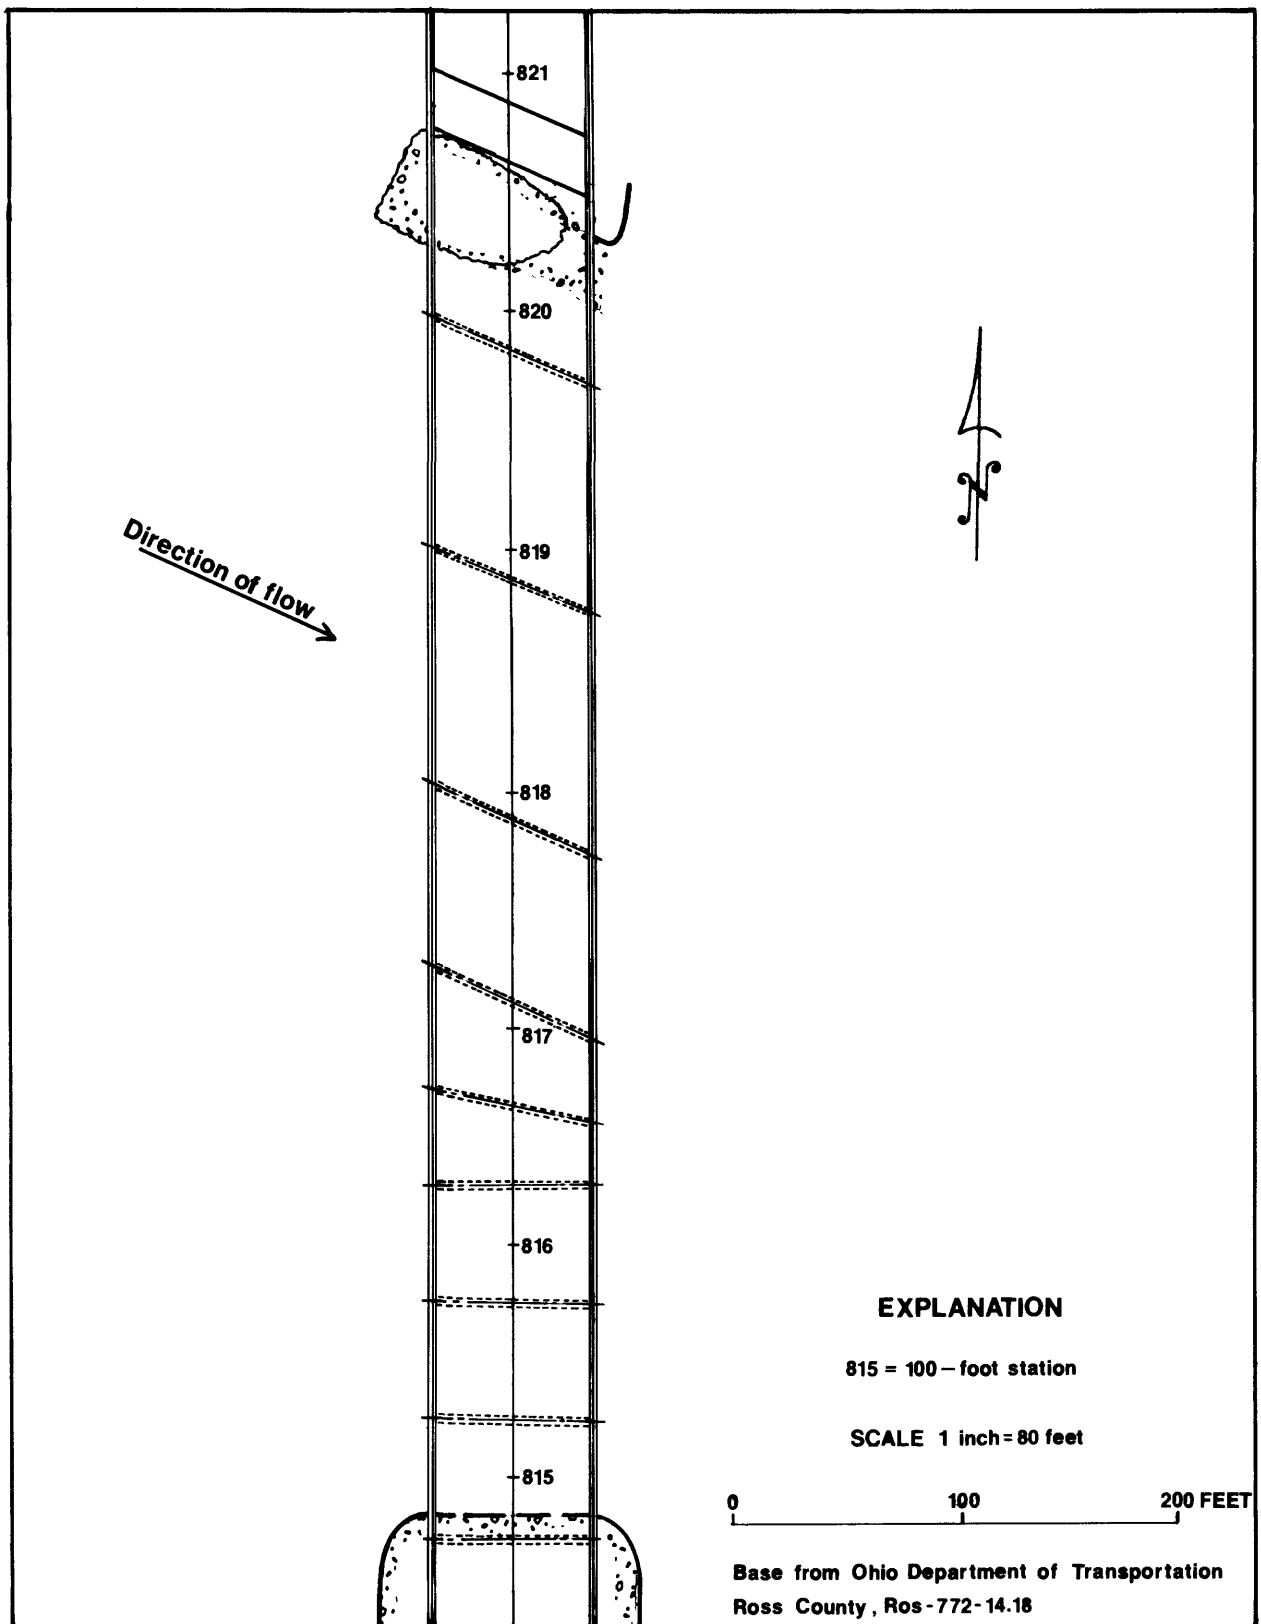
Plan of proposed bridge and approach roadway, Paint Creek at State Route 772, Chillicothe, Ohio.
